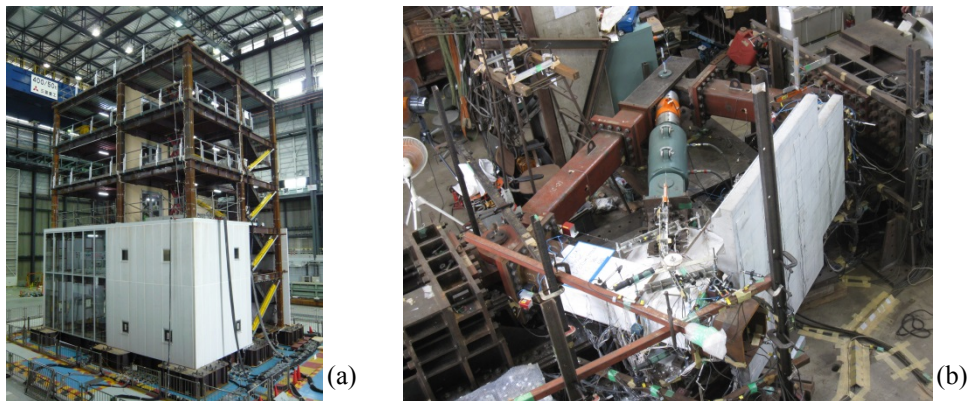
(a) Exterior view of the building specimen, and (b) subassembly specimen
